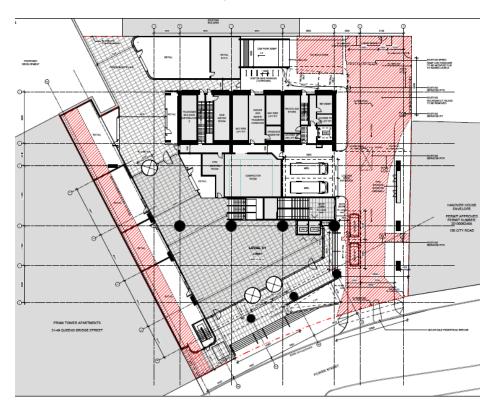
A - Ground floor plan of proposed development (source: application plans prepared by Grimshaw Architects)
